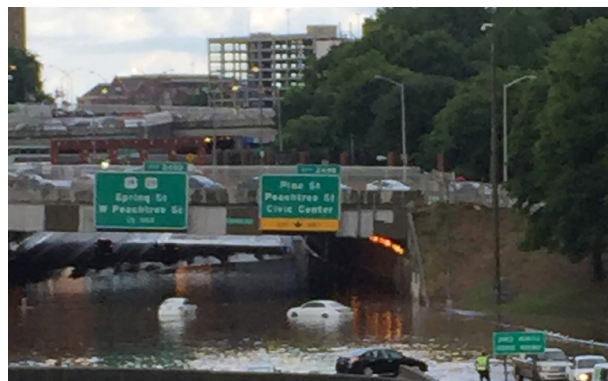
Flooding of I-75/85 closed all lanes of traffic, bringing Atlanta to a standstill
